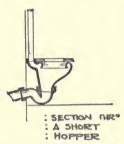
Diagram showing Construction of a Short Hopper Closet.
